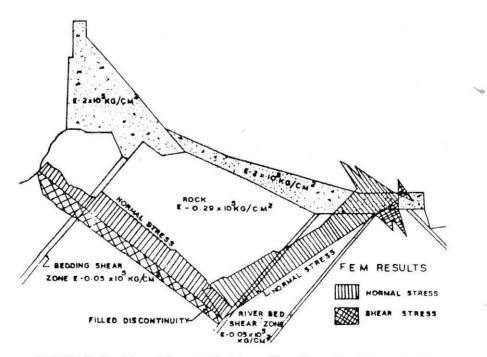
Provision of Concrete Strut Across Shear Zone (Salal H.E. Project)
